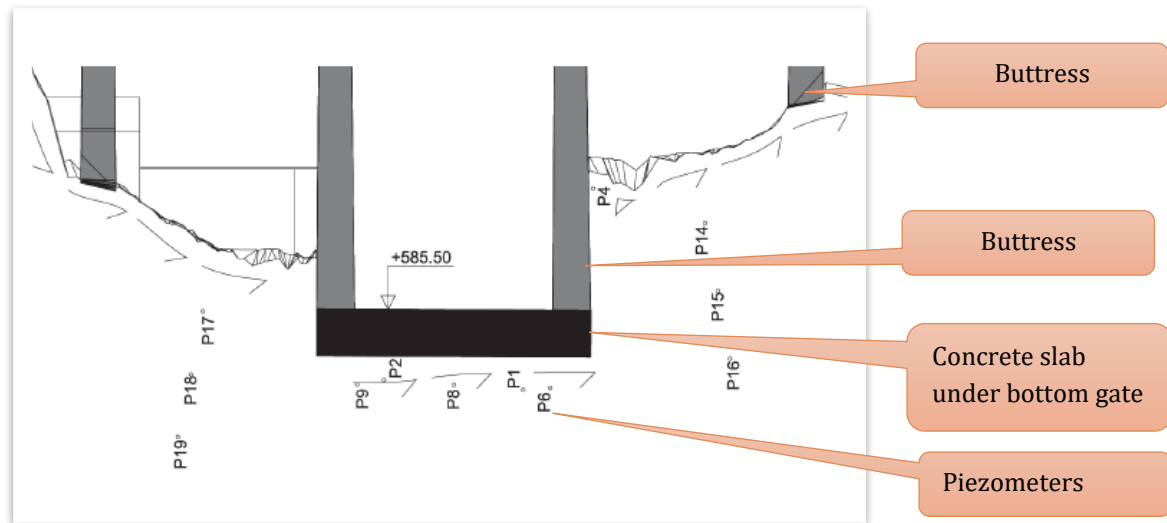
Downstream elevation of the concrete slab under the bottom gate, with adjacent hollow sections and buttress supports. The location of the sensors in the foundation is also shown
